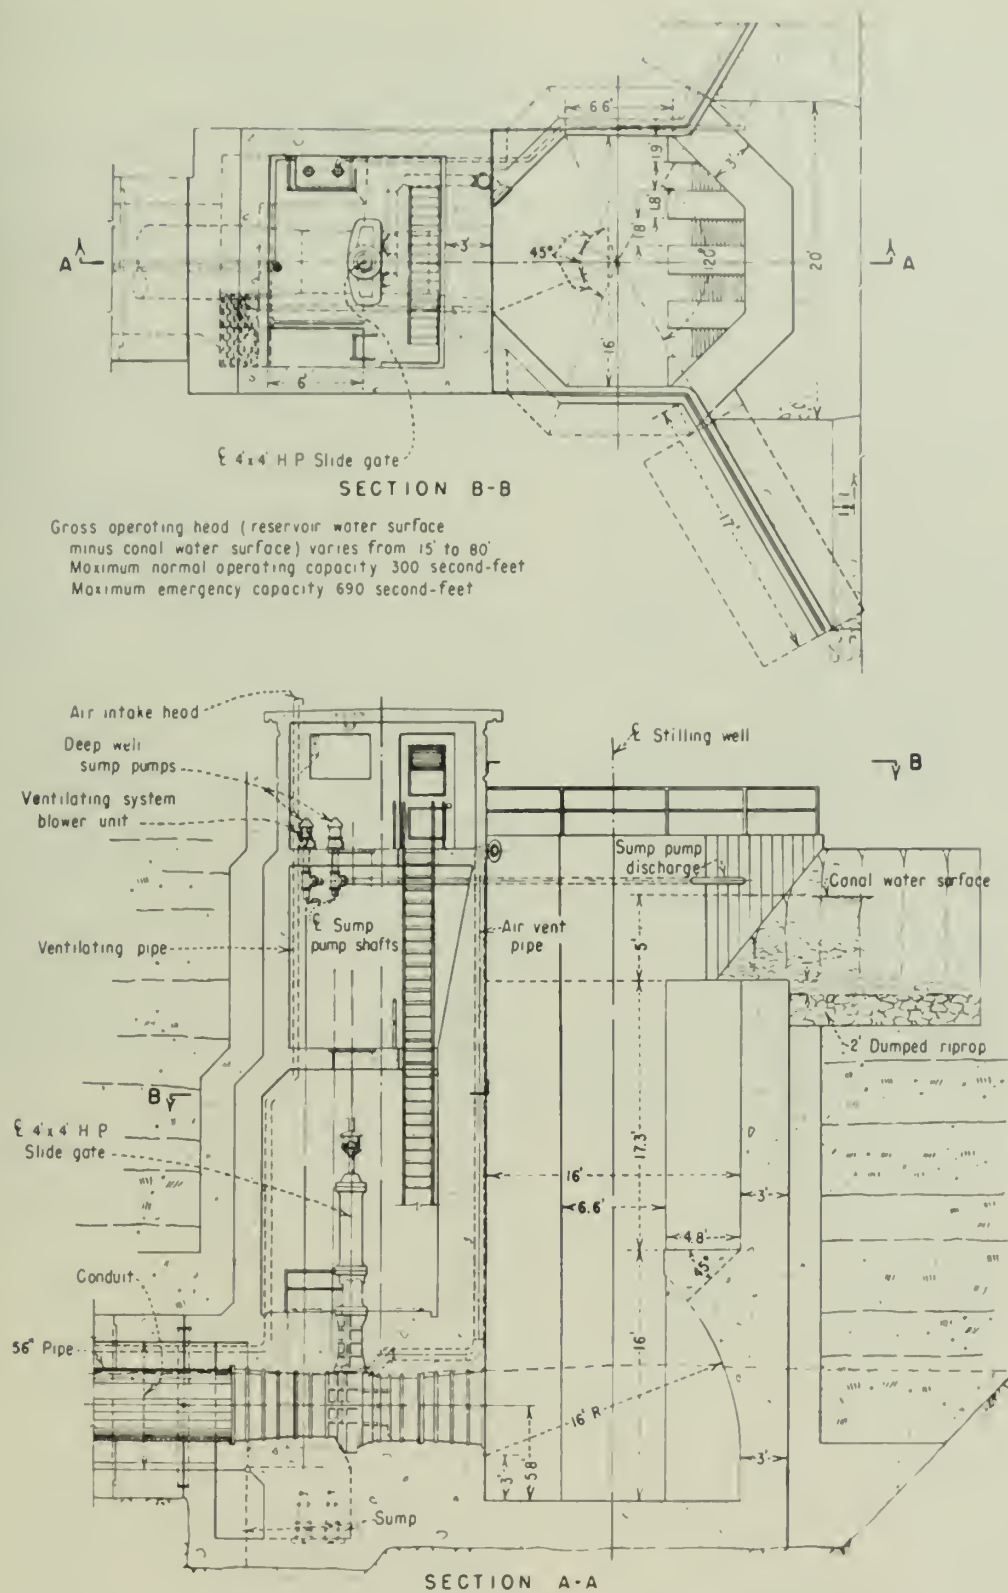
Riser well energy dissipator installation at Trenton Dam, Neb.
